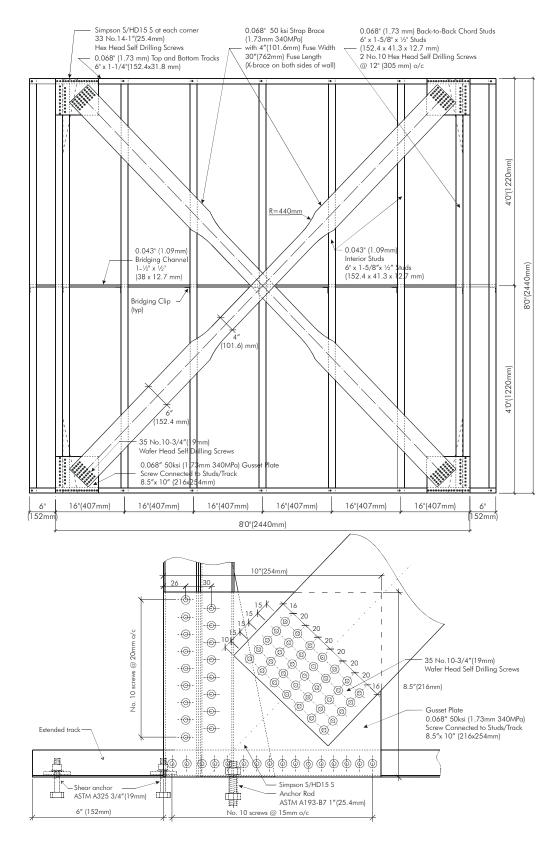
Nominal dimensions and corner detail of specimen 29A-M 1
